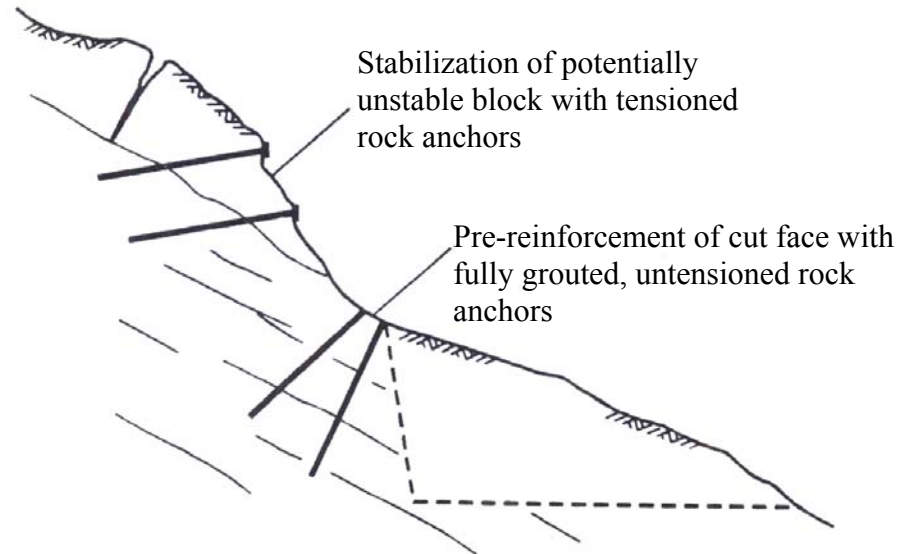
(a) Tensioned rock bolts to prevent sliding of a loosened rock block and (b) fully grouted, untensioned rock bolts (dowels) installed prior to excavation for reinforcement (after Wyllie and Mah, 2004).
